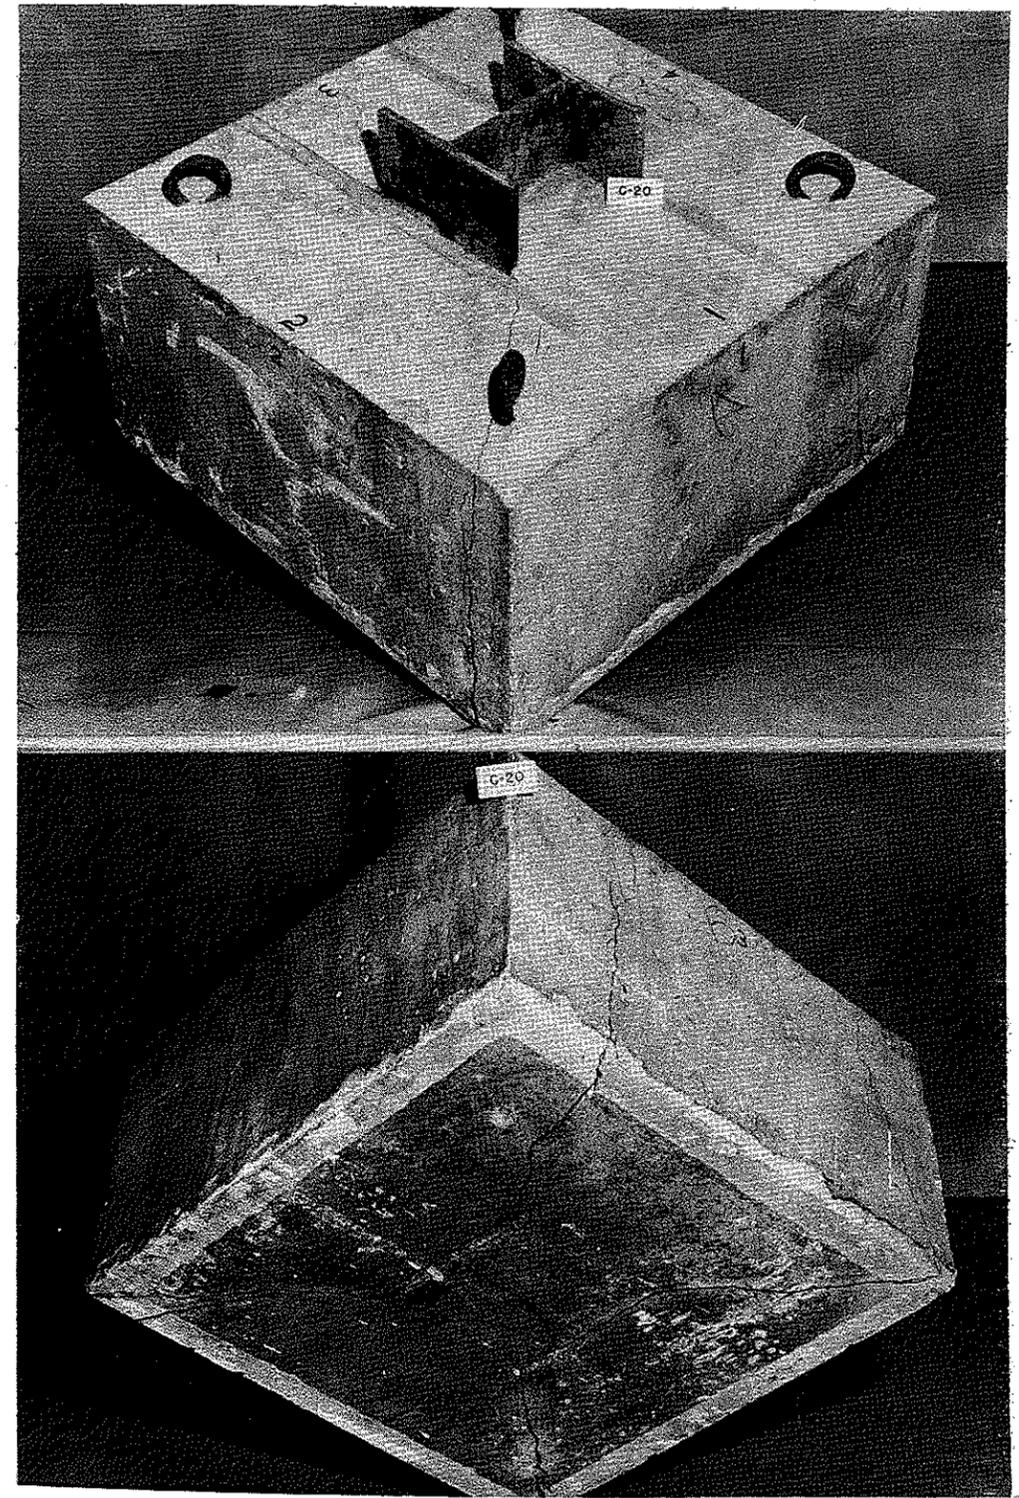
APPEARANCE OF SPECIMEN C-20 AFTER TESTING.
